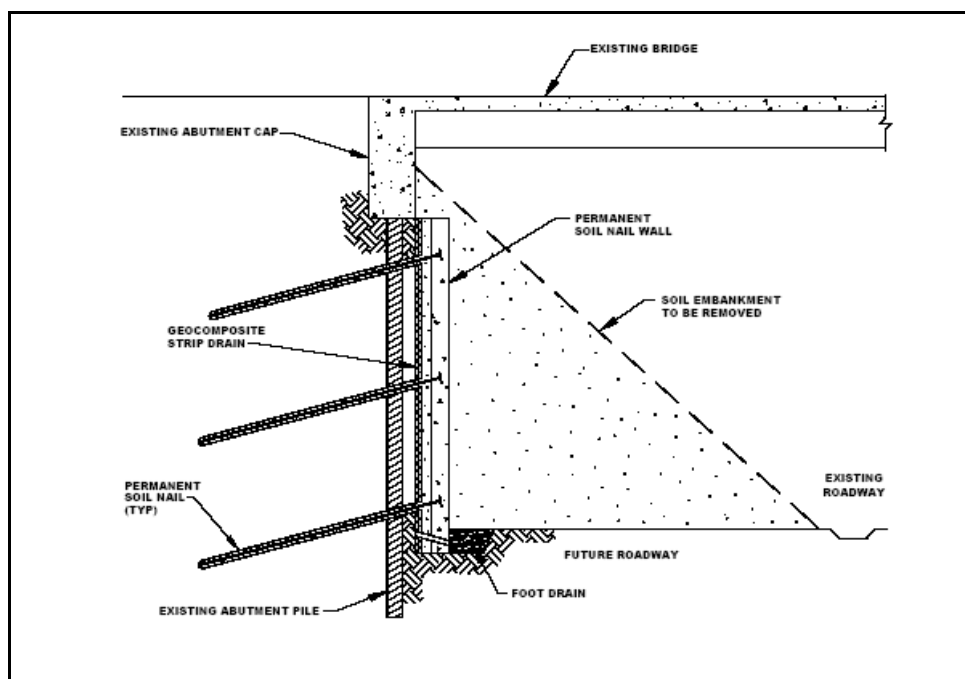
A typical construction of road widening under existing bridge (FHWA, 2003)
